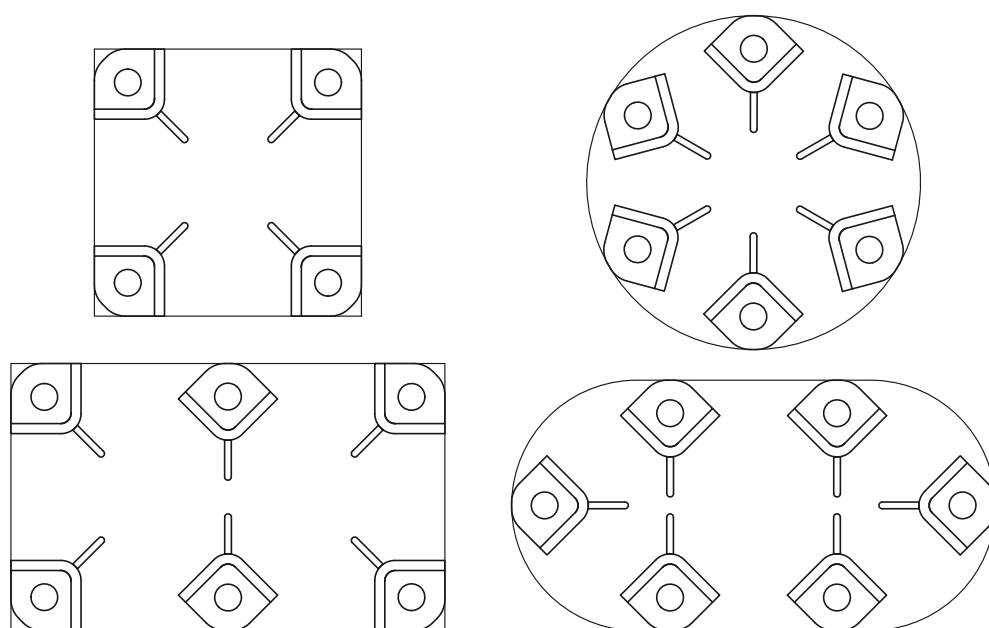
HPKM Column Shoes and HPM anchor bolts in column connection
